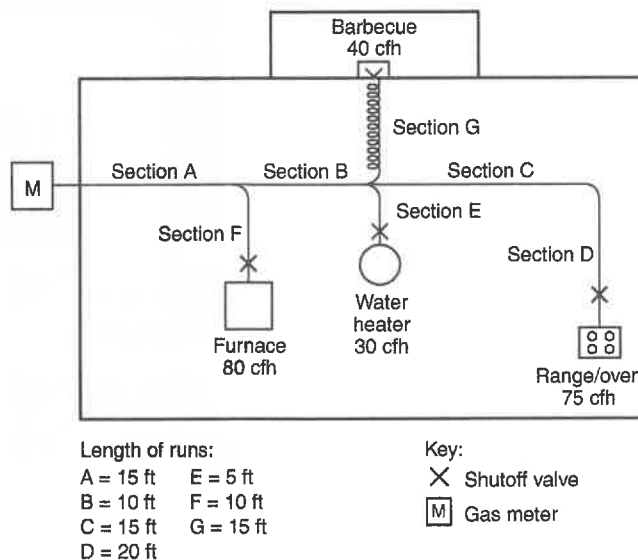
Piping Plan Showing Modification to an Existing Piping System.
